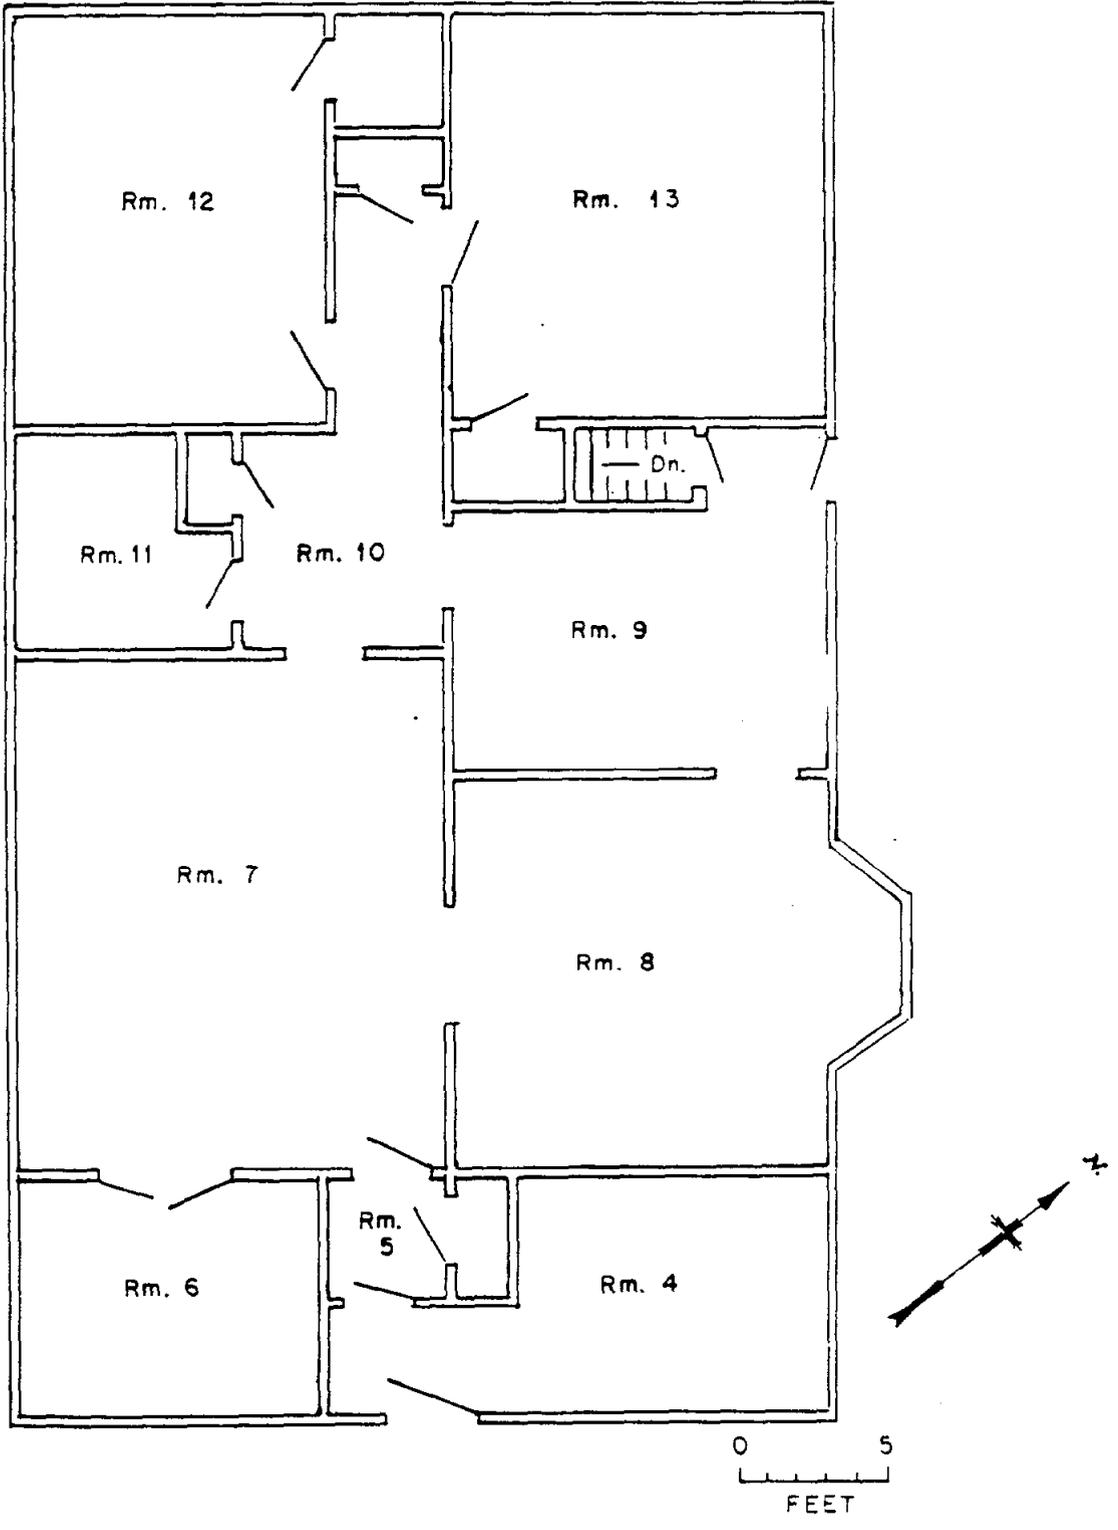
Location of rooms on top floor at 475 Davison Avenue.
